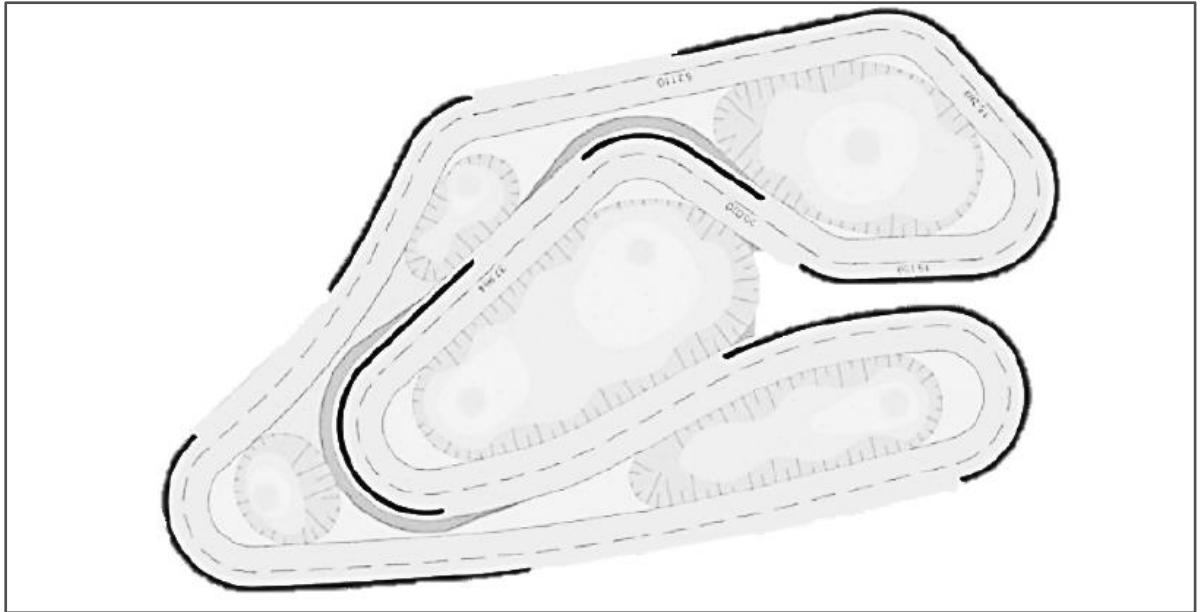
| Pump track Concept Plan (Source: Applicant's SEE)
